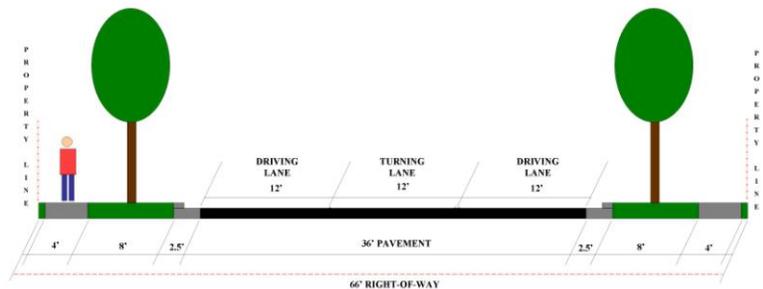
Typical Street Cross Section of where local corridor street intersect Monroe and Washington Boulevards.
